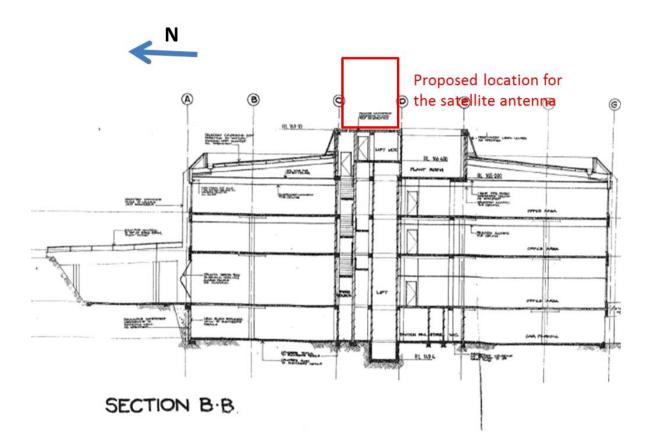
Proposed Satellite Antenna Location at the National Playout Centre, West Elevation
